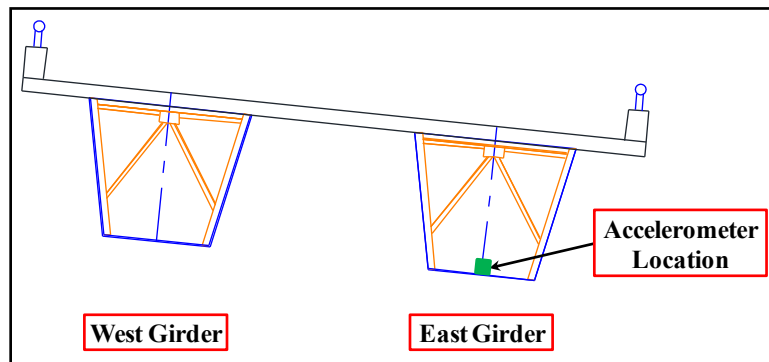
Location of the accelerometer at the cross section of Bridge B
